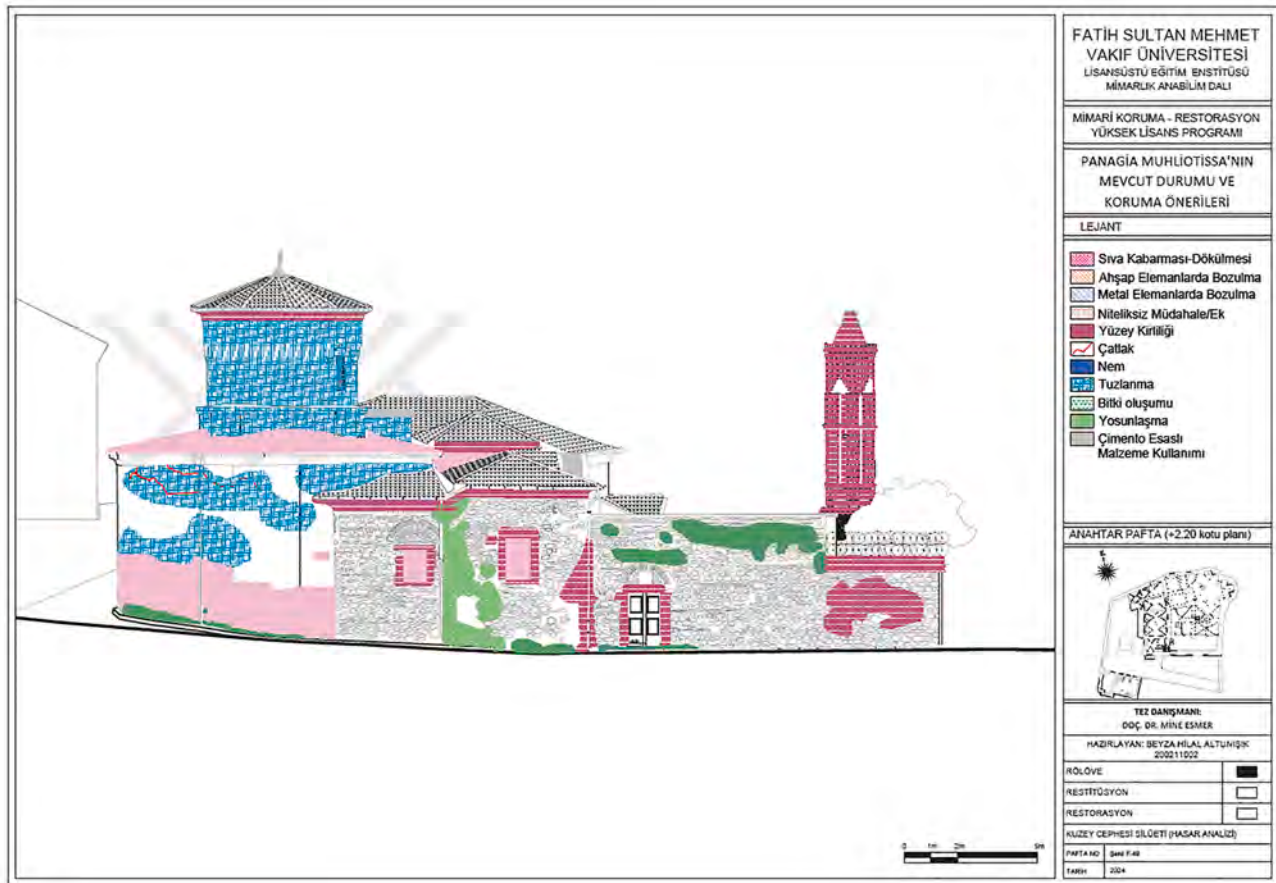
Muhliotissa, current survey, north silhouette, damage analysis (Altunışık, 2024).
